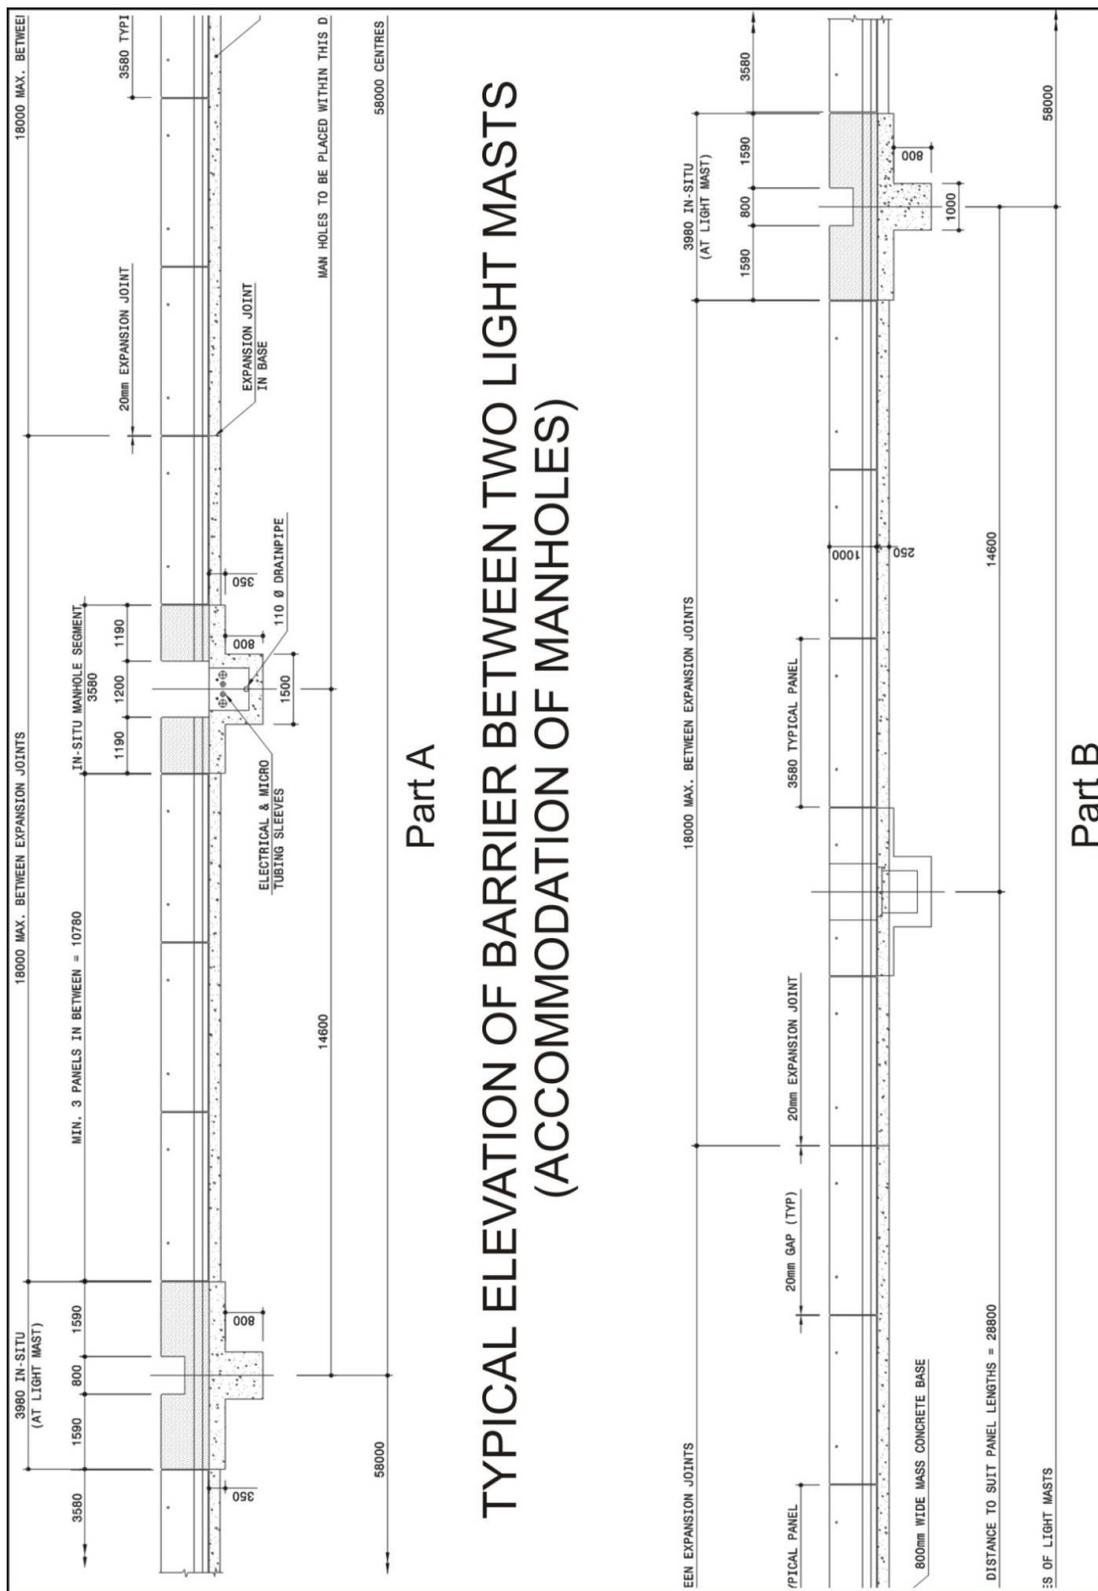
TYPICAL ELEVATION OF BARRIER BETWEEN TWO LIGHT MASTS
